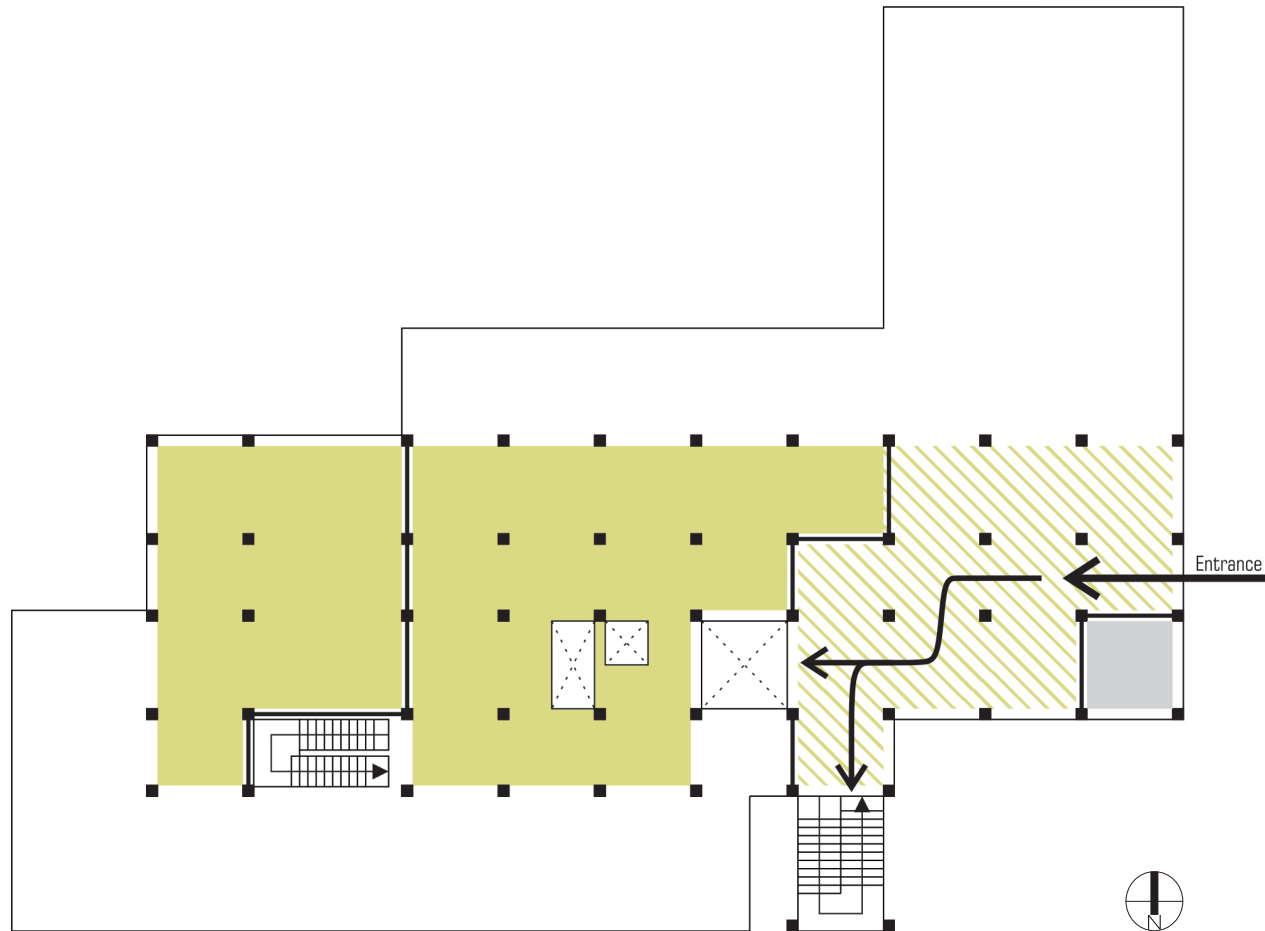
Diagram of existing ground floor layout indicating main circulation route from pedestrian access (by Author)
